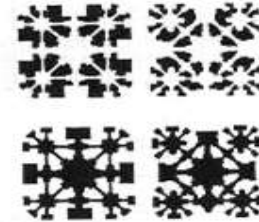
TajMahal plan (Koch, Eba, 1991).
